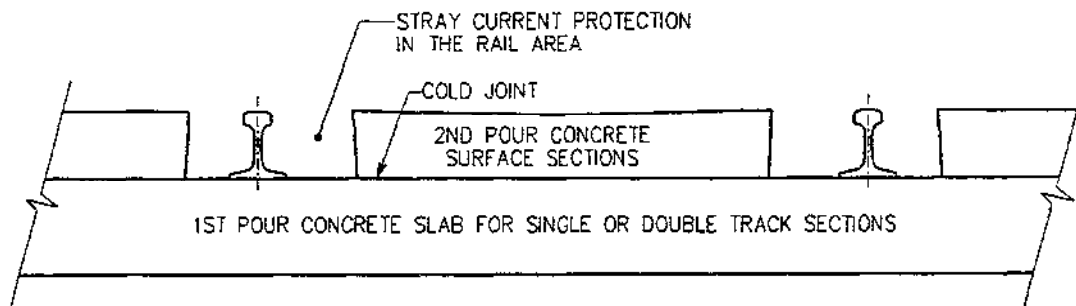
Two-Pour Concrete Slab with Two Individual Rail Troughs
